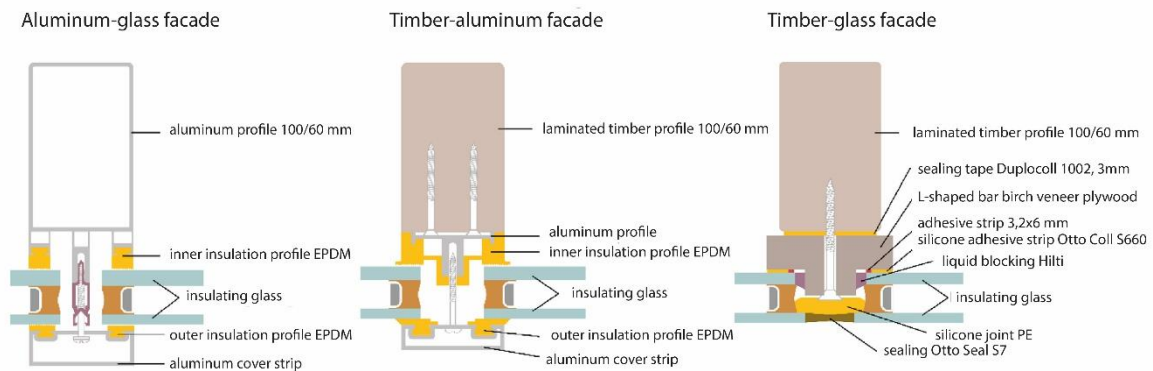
Overview of the examined façades: aluminum-glass-façades, timber-aluminum- façades and one variant of the timber-wood concrete-glass façades with an L-shaped bar (birch veneer plywood). Own representation based on (Pascha & Winter, 2016).
